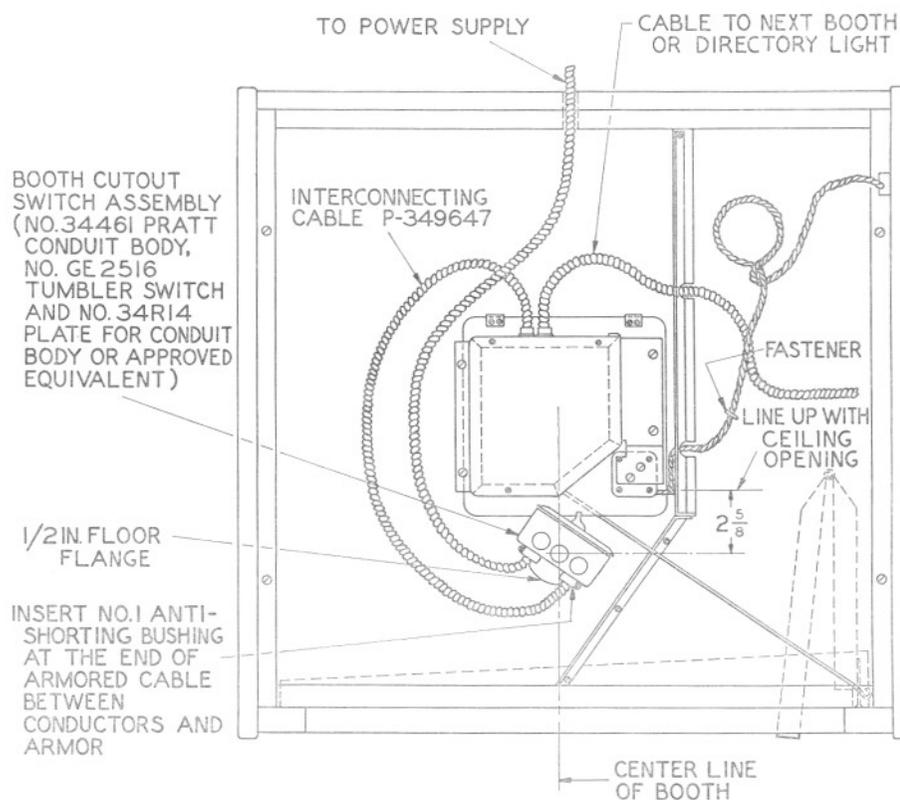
Typical Cutout Switch Installation with 4-type Light Fixture
